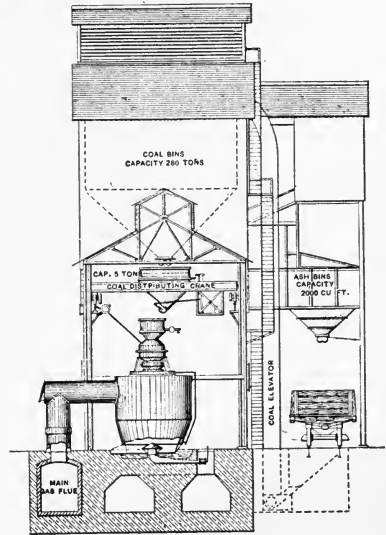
Gas producer plant showing coal and ash-handling equipment
